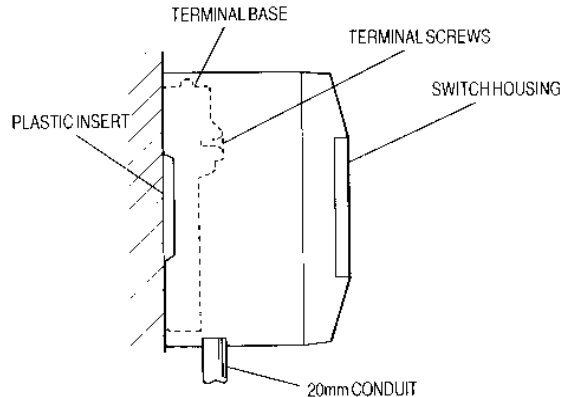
METHOD B – Wall-Mounting to Single or Double-Gang Conduit Box (To BS 1363)
